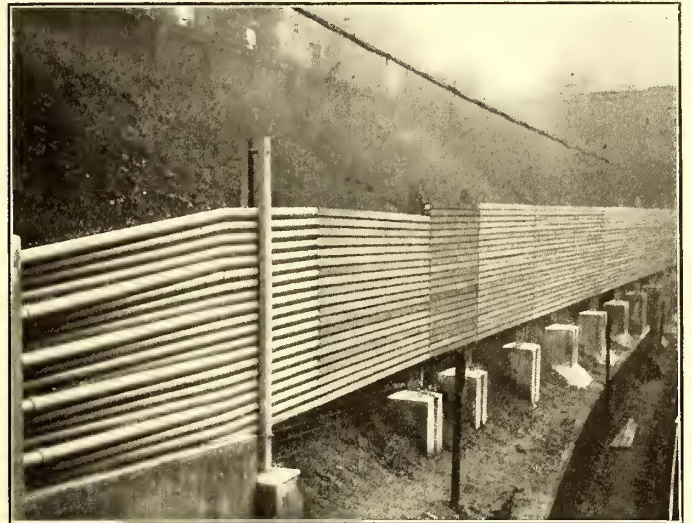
CABLE TROUGHING CONSTRUCTION, HIGH STREET TUNNEL, LOOKING WEST
